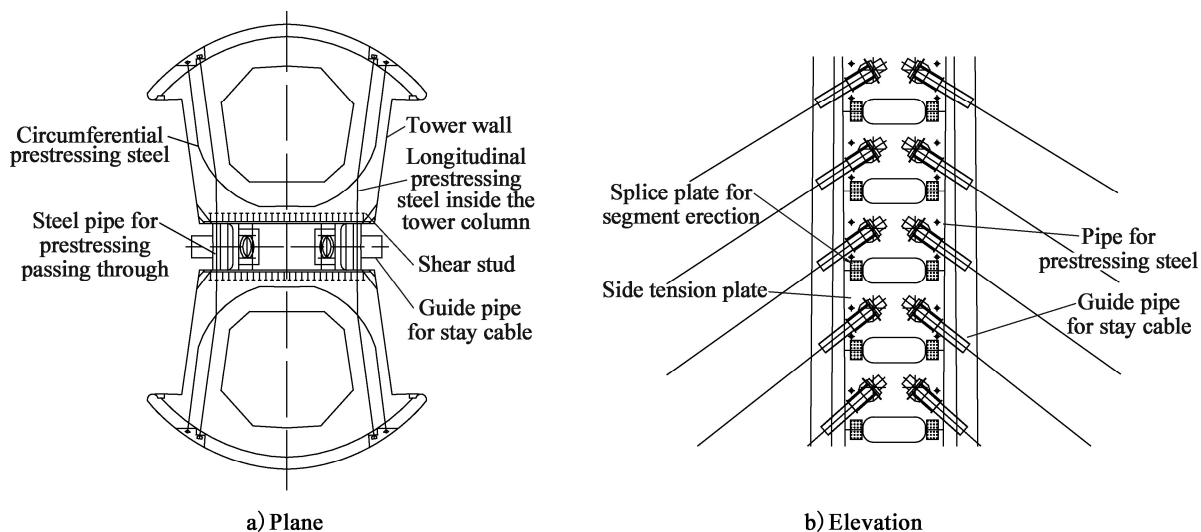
External steel anchor box structure in chongqing dongshuimen yangtze river bridge
